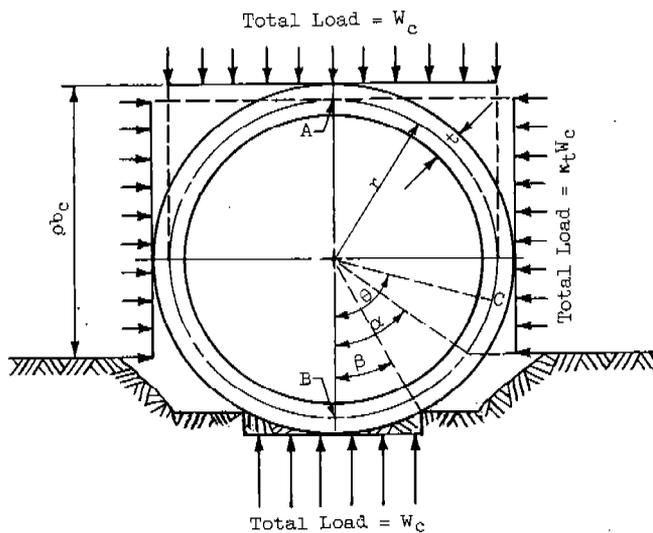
Assumed load distribution on an underground conduit installed on a projecting bedding
